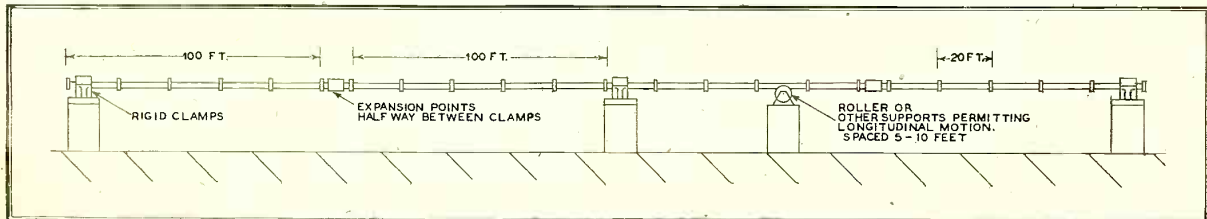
PROPOSED CONSTRUCTION FOR A LONG LINE COMBINES RIGID AND ROLLER MOUNTS, AND EXPANSION JOINTS
